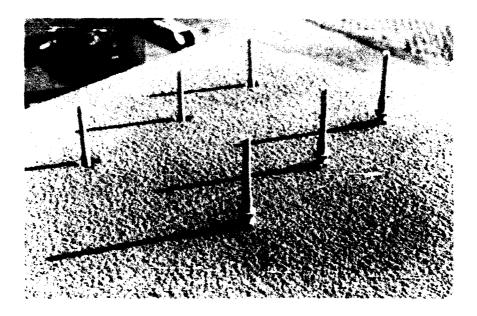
Injecti-port nozzles inserted into a drilled port hole and surface mounted onto the concrete test slab (before application of seal coat)
